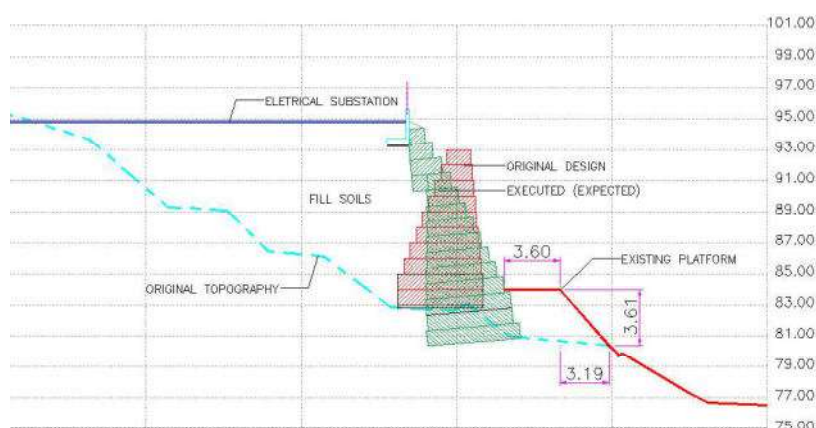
Gabion wall from the original design and gabion wall as executed (expected).
